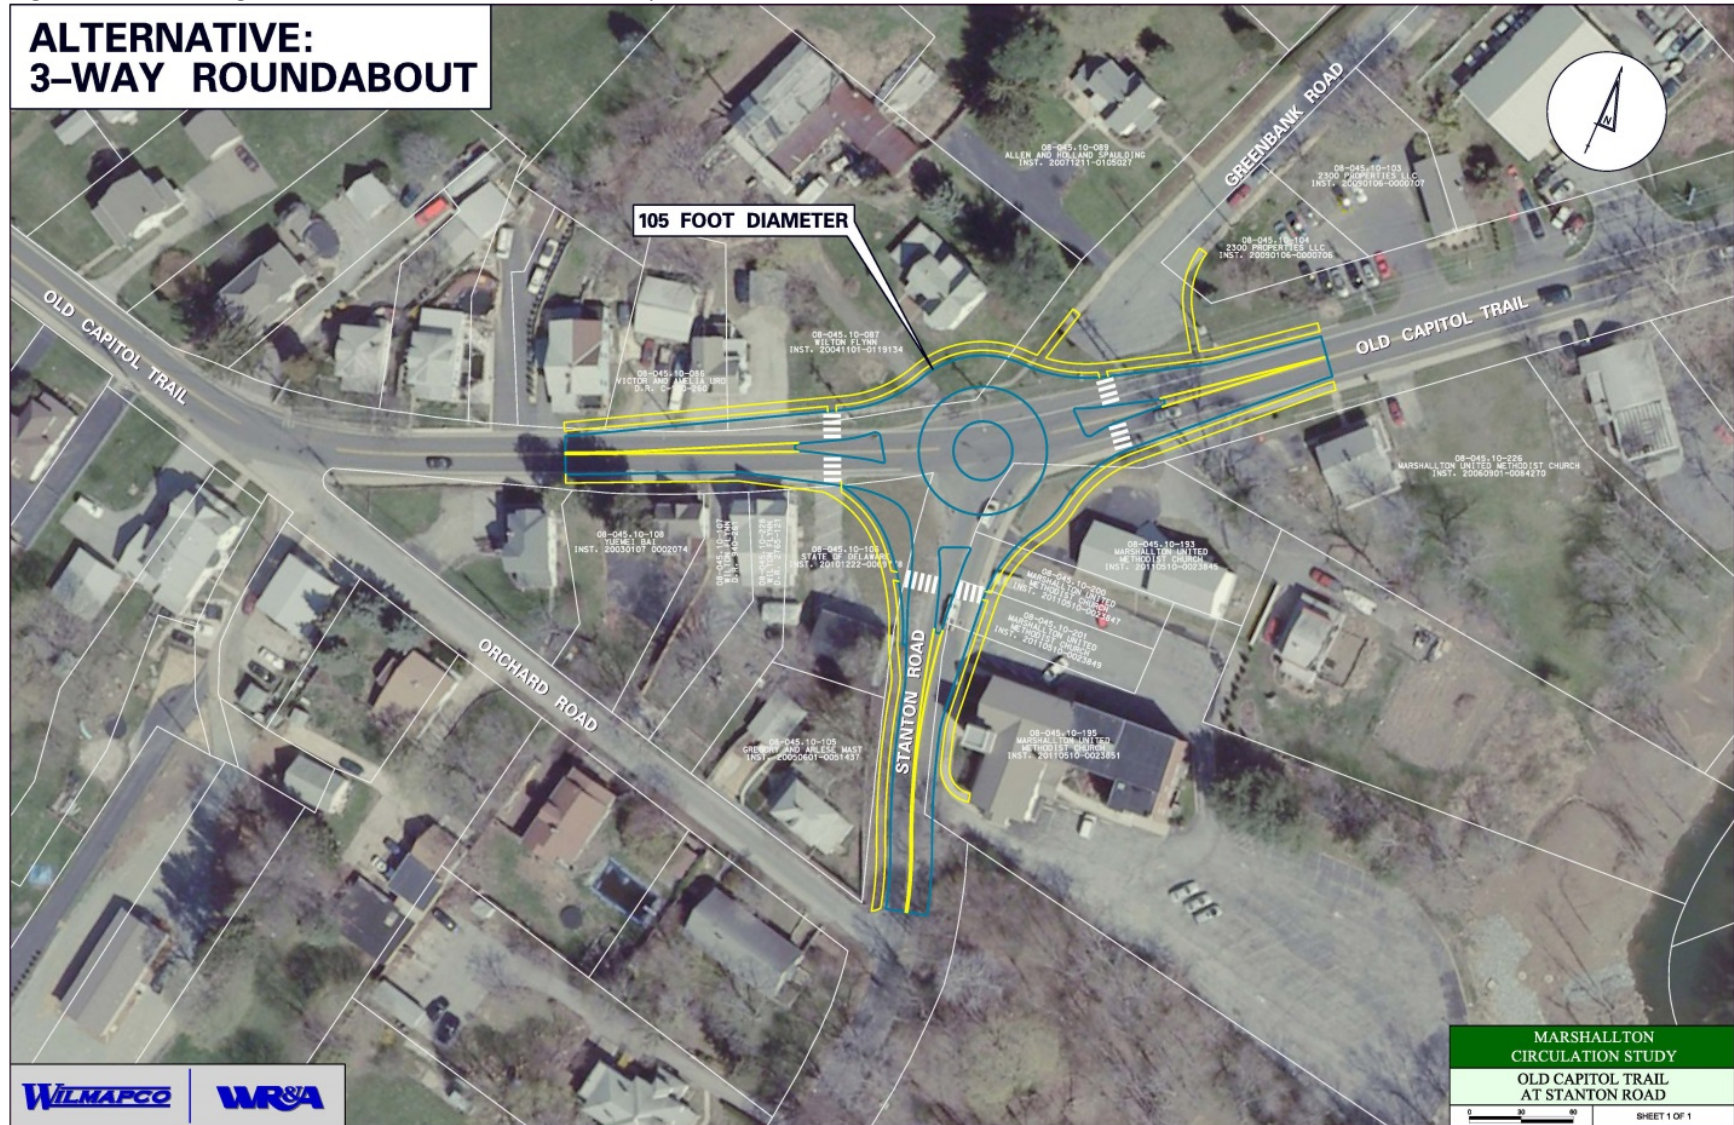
Three-leg roundabout alternative at Old Capitol Trail and Stanton Road.
